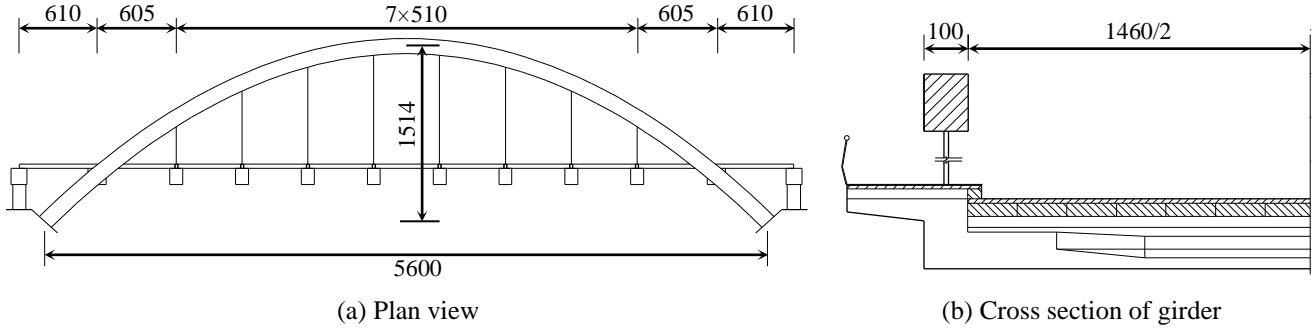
Dimension and configuration of reinforced concrete arch bridge (Unit: cm)
